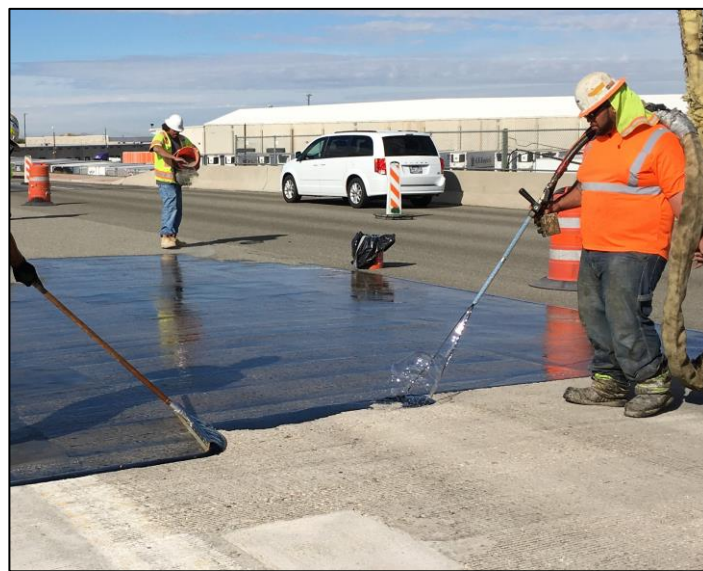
Application of Healer Sealer (UDOT 2017)
